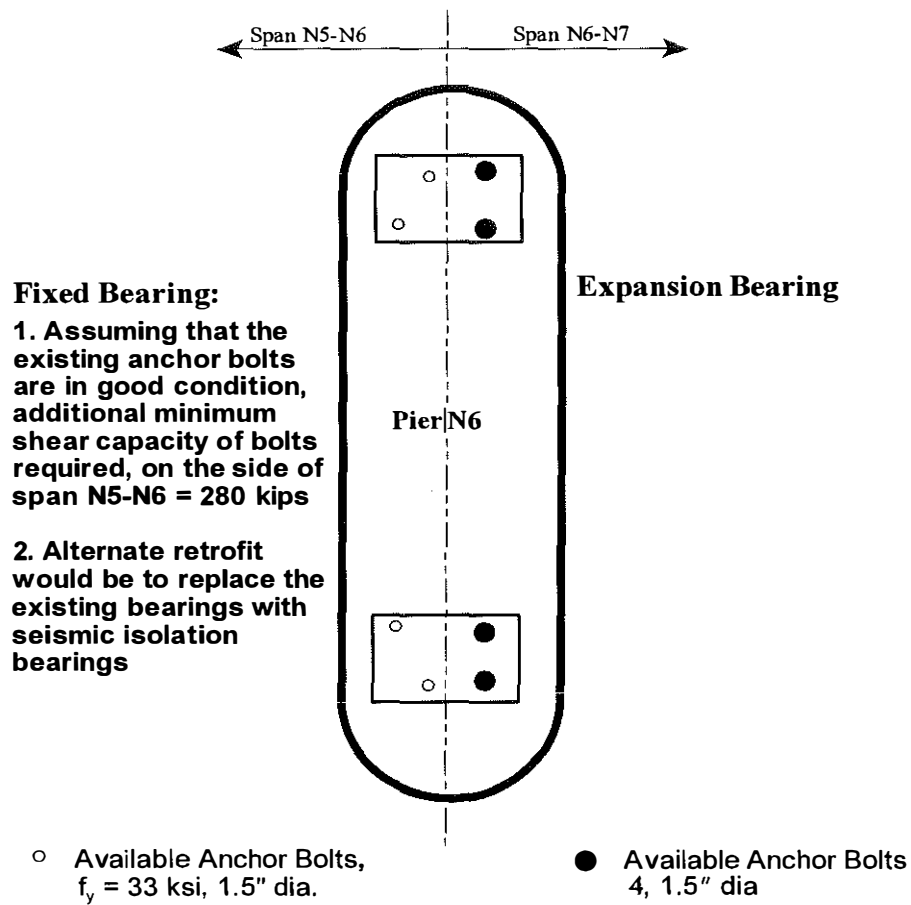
Minimum Required Shear Capacity ( $V_{req}$ ) to be Provided by Additional Anchor Bolts at Bearings of Pier N6 on the Evansville, IN Approach of the US41 Northbound Bridge
